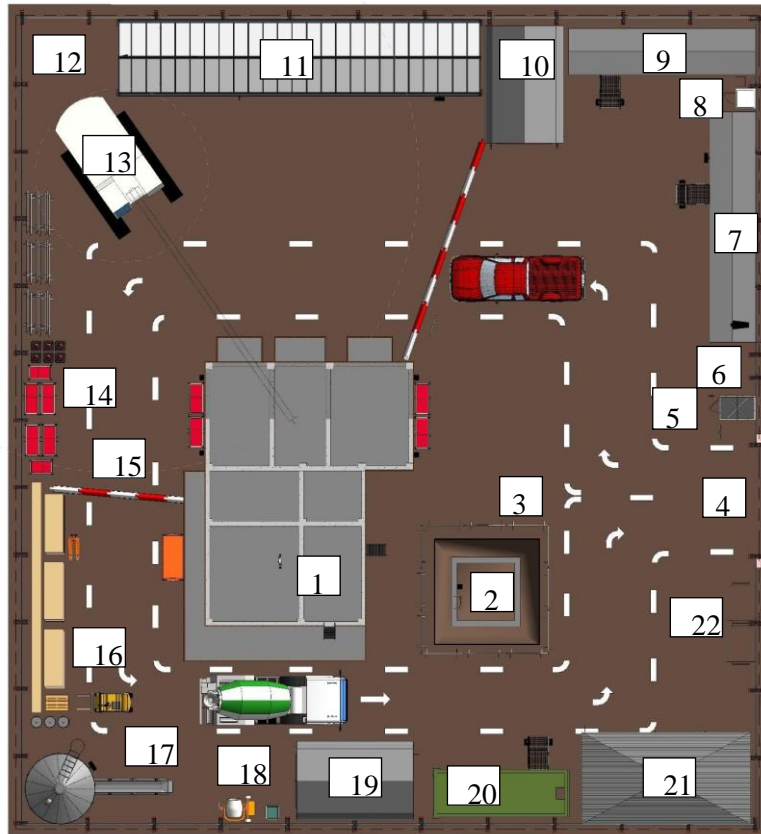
Construction site facility arrangement with safety measures in BIM form
